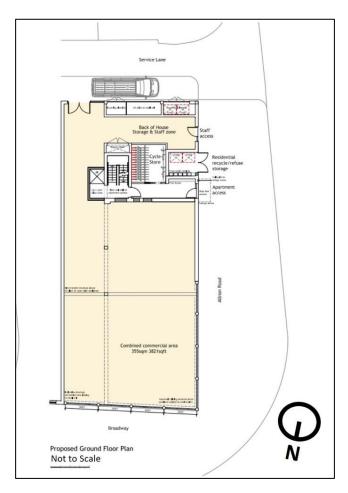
Approved Ground Floor Layout Plan (extract mab Architecture drawing A-100B)
